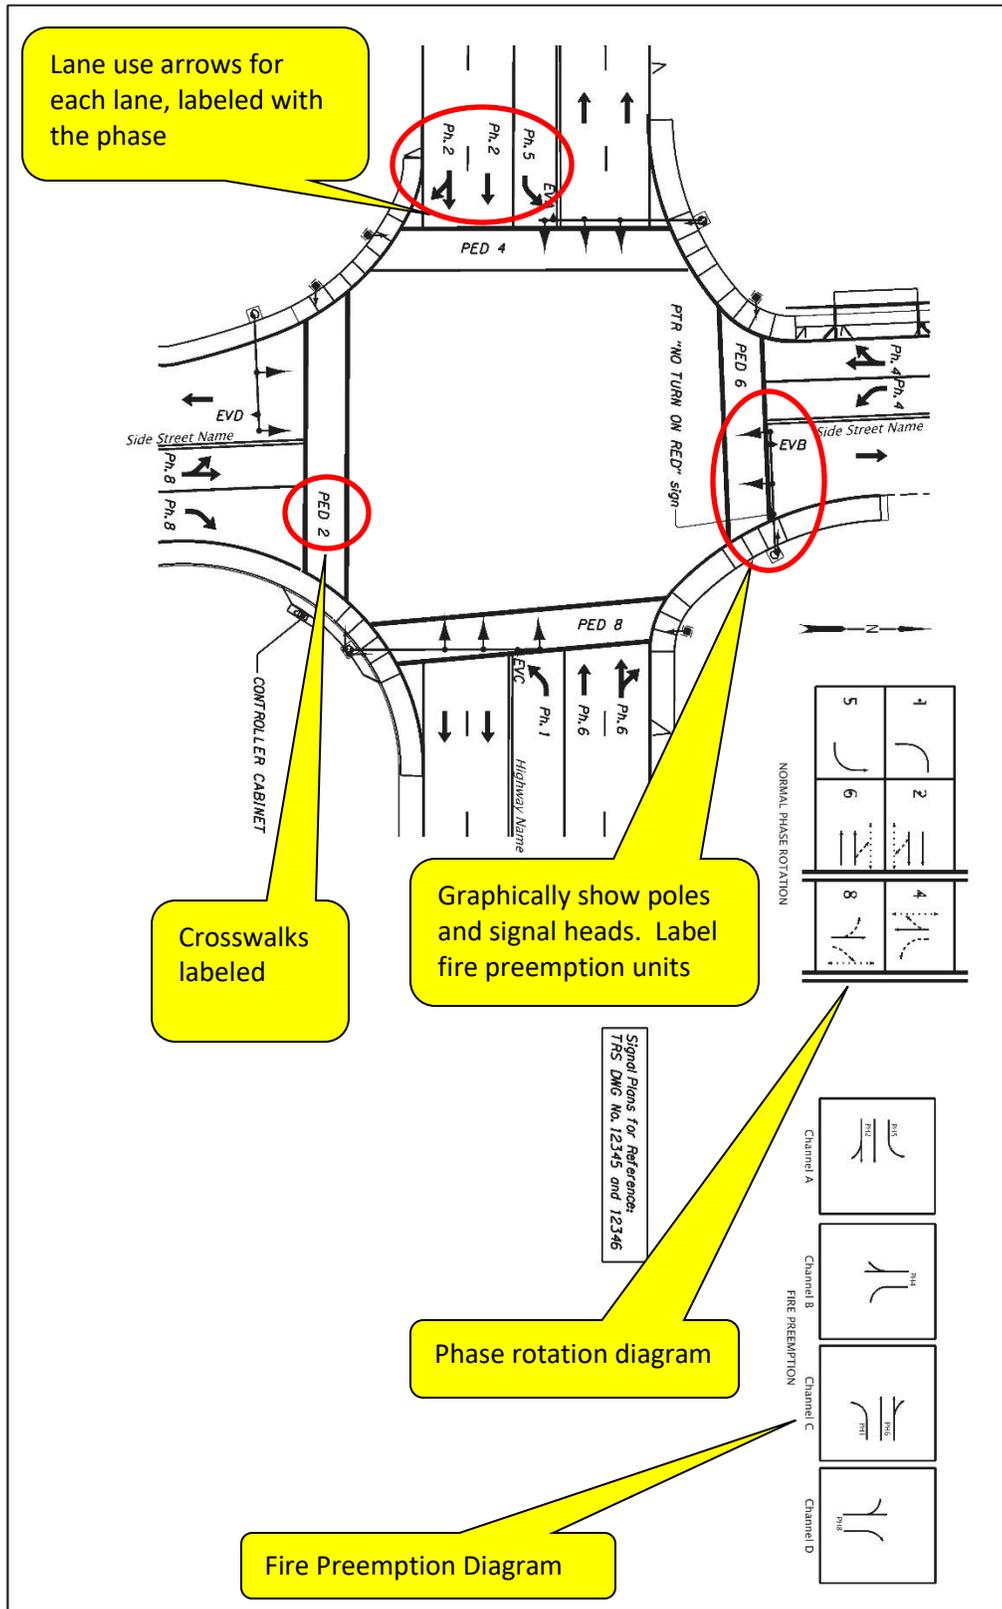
| 332S Cabinet Print (page 6 – Intersection Drawing) Example 2
